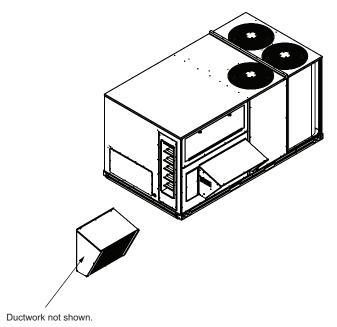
Attach Relief Damper Hood Assembly to Return Duct
